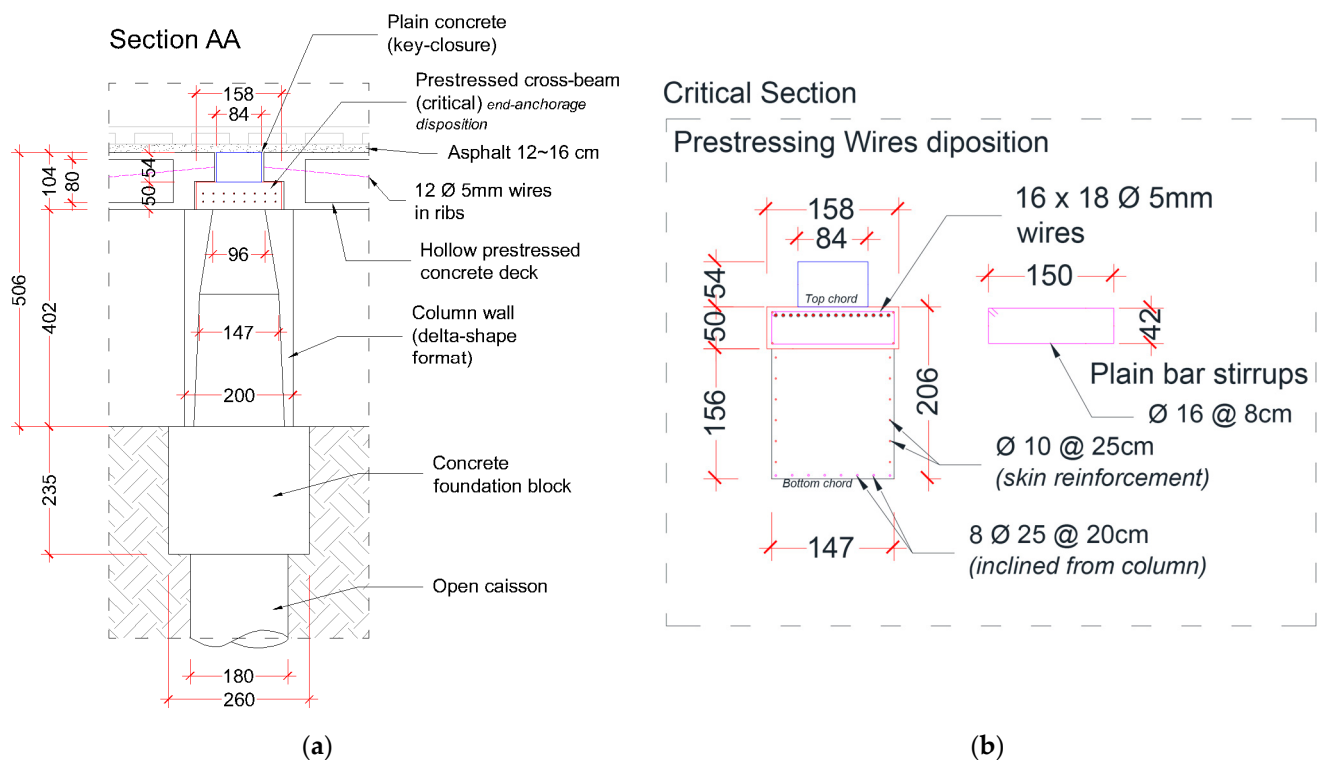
Detailing retrieved from site investigations: (a) Section AA of the column wall, which supports the hollow deck; (b) critical section for computing the capacity of the element. Units in cm, rebars are in magenta, plain concrete is in blue, dimension lines in red, $\varnothing$ = diameter of rebars; @ = spacing of centers.
